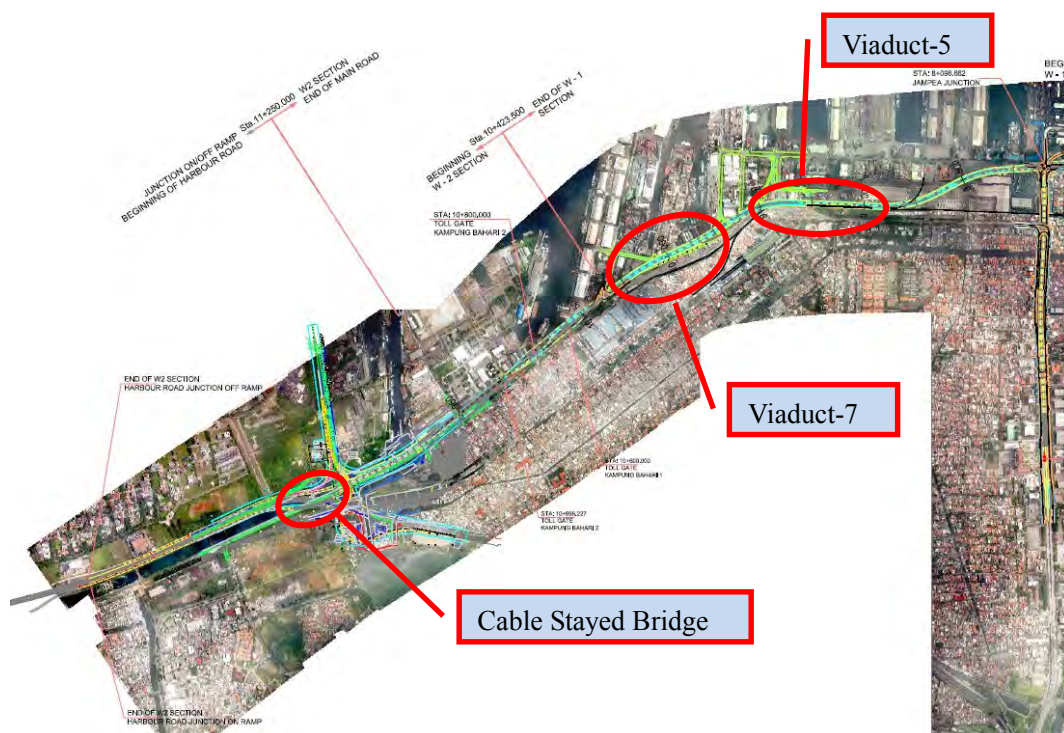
Location of Viaduct-5,7 and Cable Stayed Bridge
